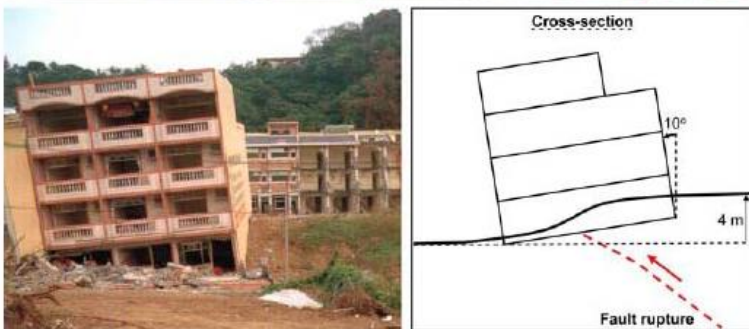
Chelungpu thrust fault, Chi-Chi, Taiwan 1999 earthquake—Chung-Cheng Park, Fung-Yan City: 4-story building resting on a continuous and rigid foundation (photos adapted from Hwang 2000). The building survived 4 m of upthrust without substantial structural damage, but subjected to approximately 10° of rigid-body rotation
